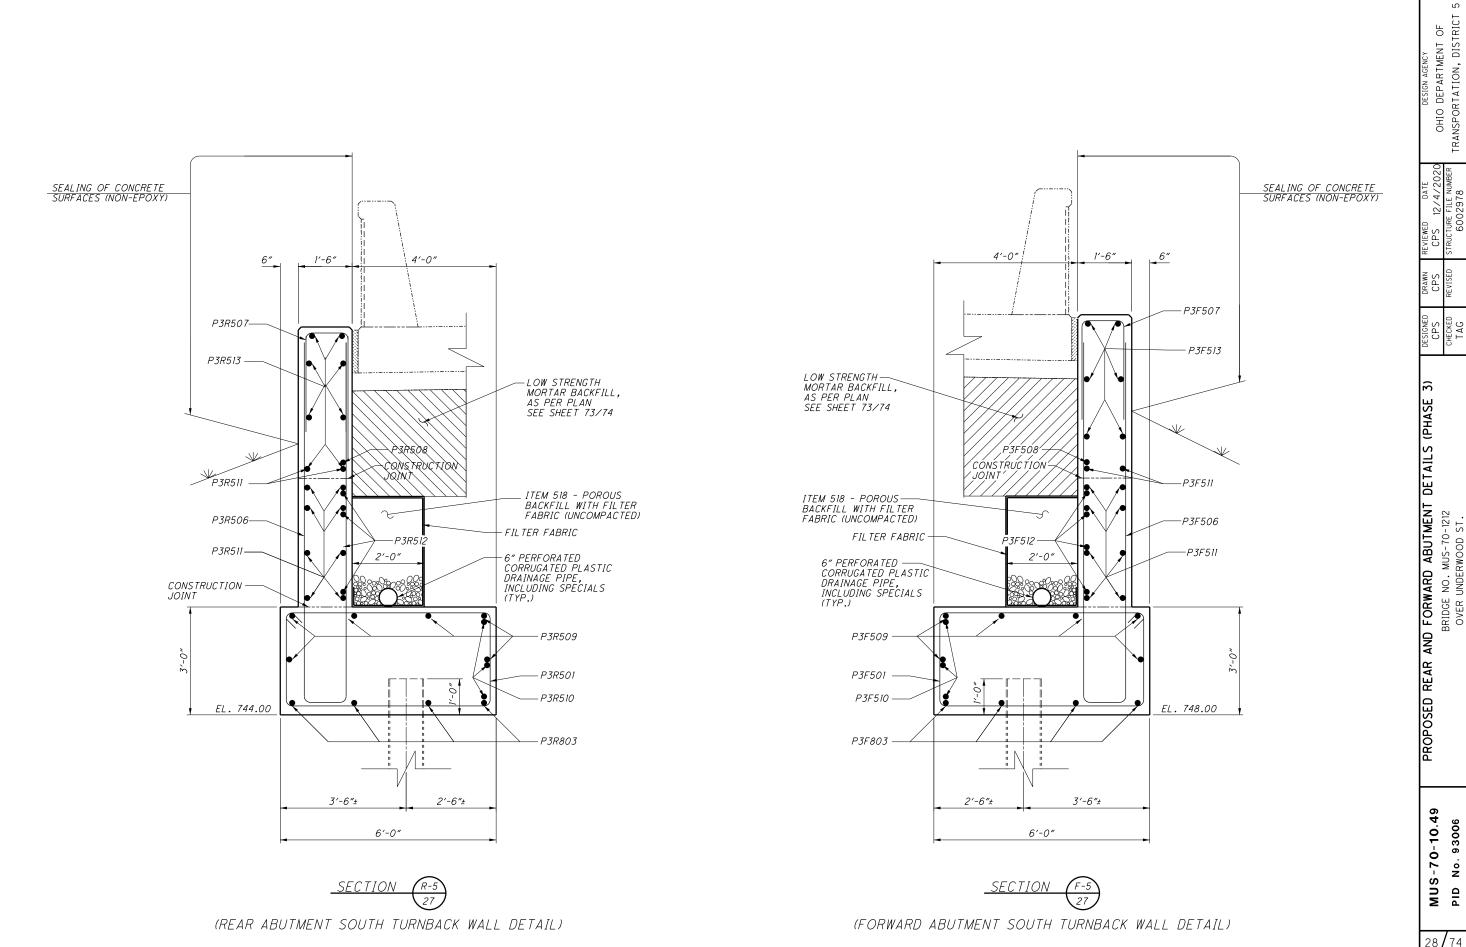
DETAILS ABUTMENT MUS-70-1212 ERWOOD ST.
